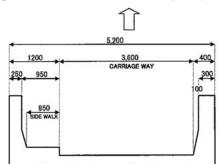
Typical cross section of one-lane bridge (Agreed at the previous meeting for signing technical memorandum on 19th Apr, 2011)
